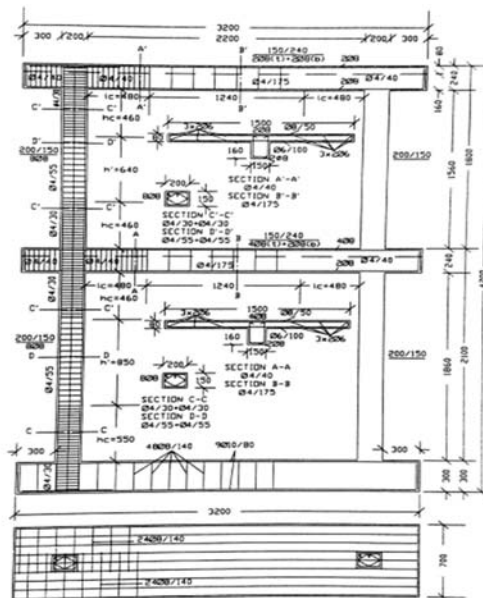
Geometric and reinforcement details of the RC-frame specimen H30. [56]
